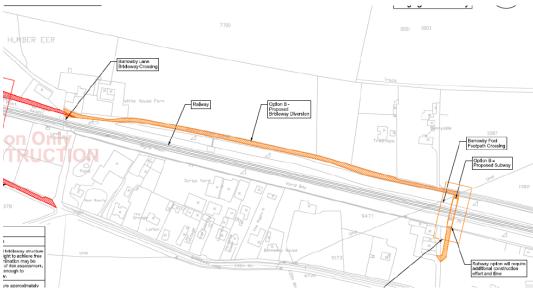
Option 2 - New subway at Barrowby Foot level Crossing
